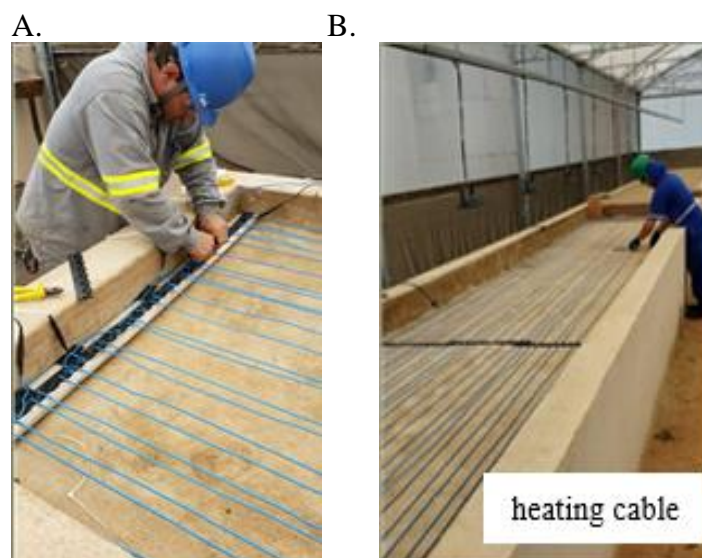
Heating cable getting installed (A), space adjustment between cables (B)
